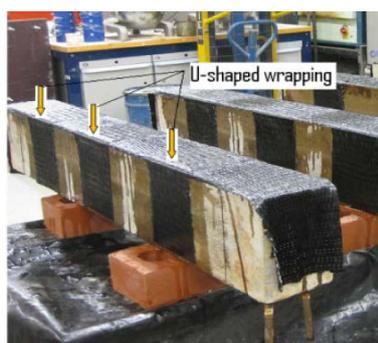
Schematic ICCP application to corroded reinforced concrete beams [24]
